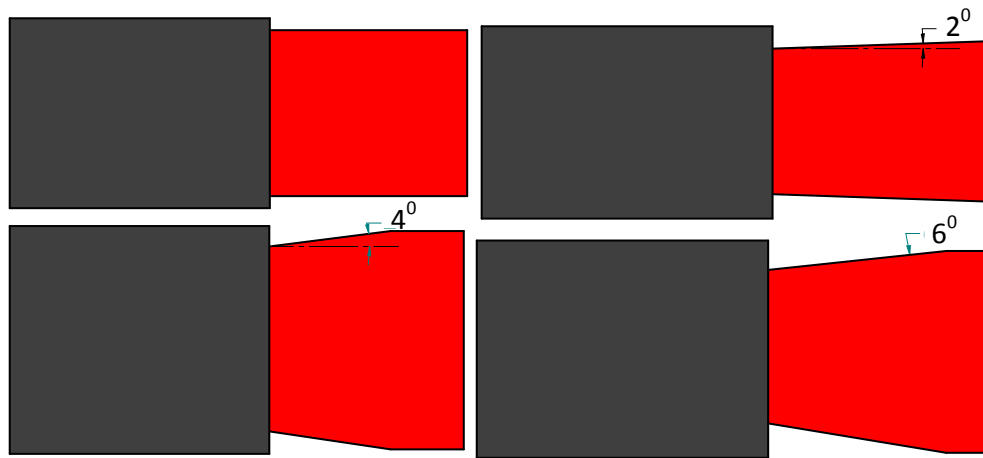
Geometry of the inner steel rod with 0, 2, 4, and 6 degree receding angle
